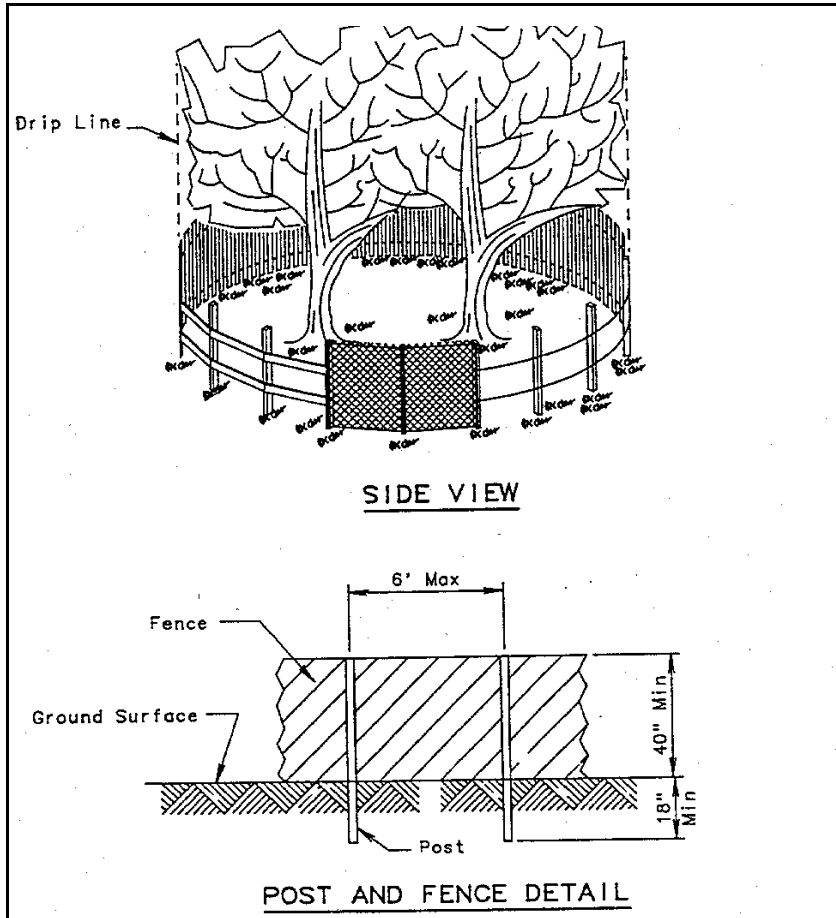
Tree Preservation - Installation Detail (Source: NRCS Files)
